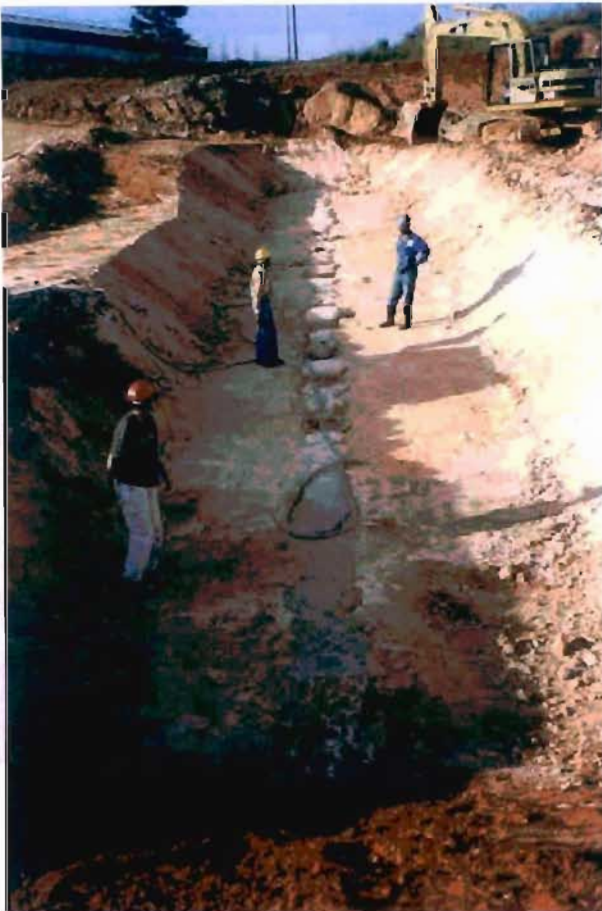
View of part of the completed, single-column, jet grout cut-off with foundation preparation detail for clay capping.
